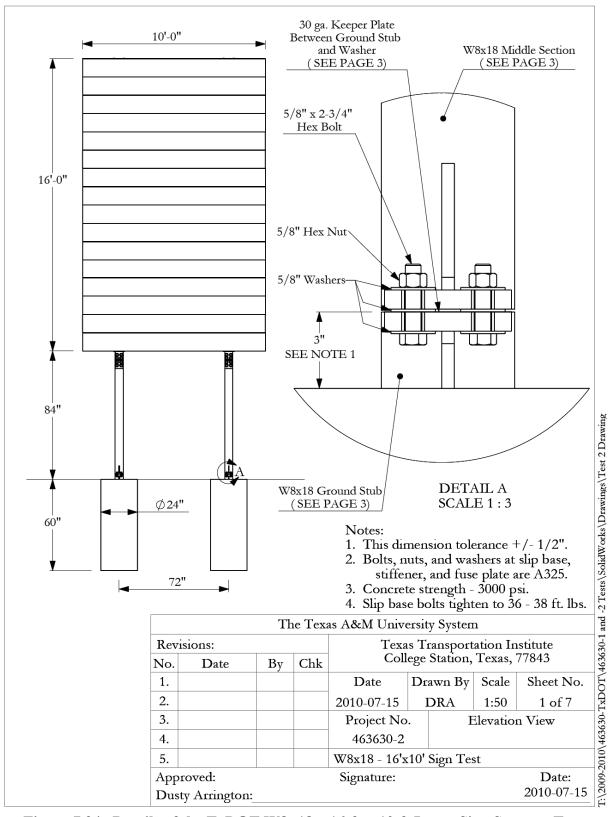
Details of the TxDOT W8×18 – 16-ft × 10-ft Large Sign Support Test Installation.
